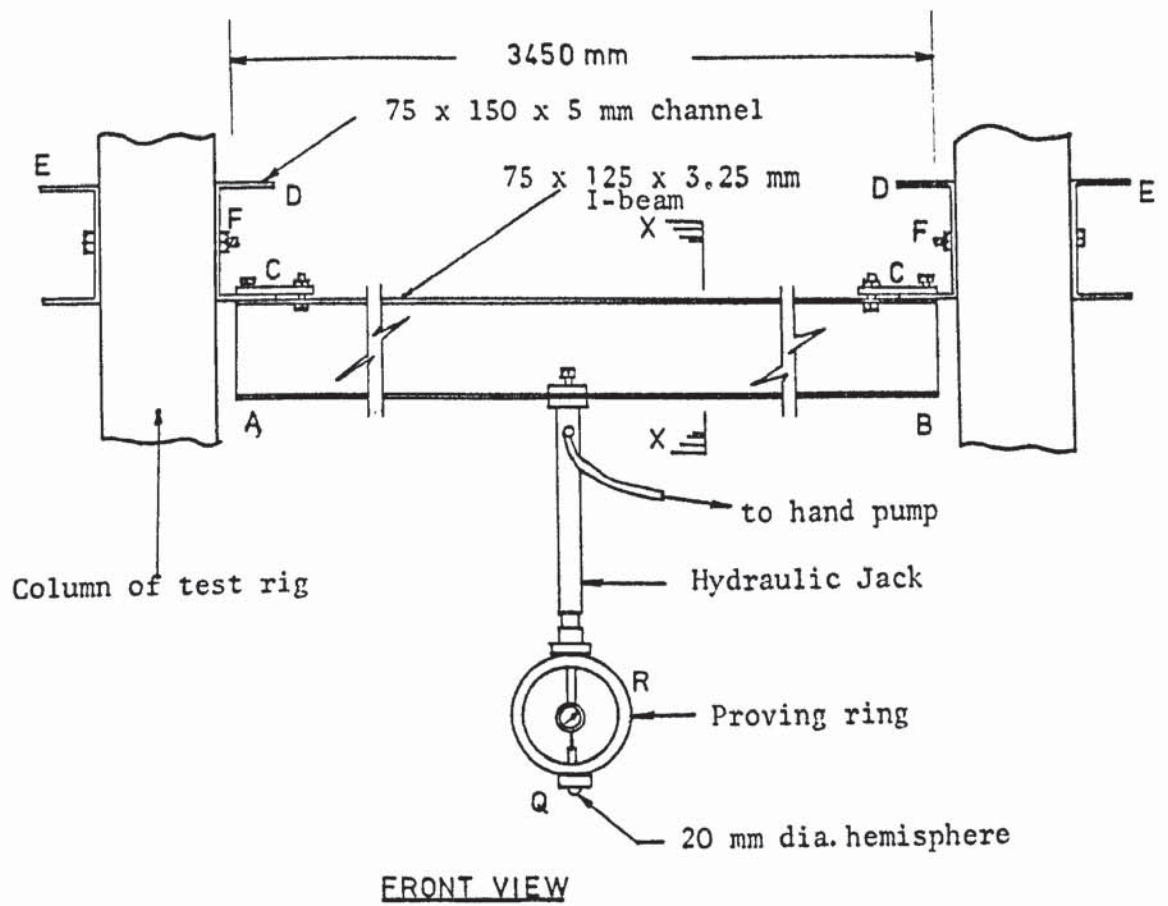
LOADING ARRANGEMENT FOR BOX CULVERT
